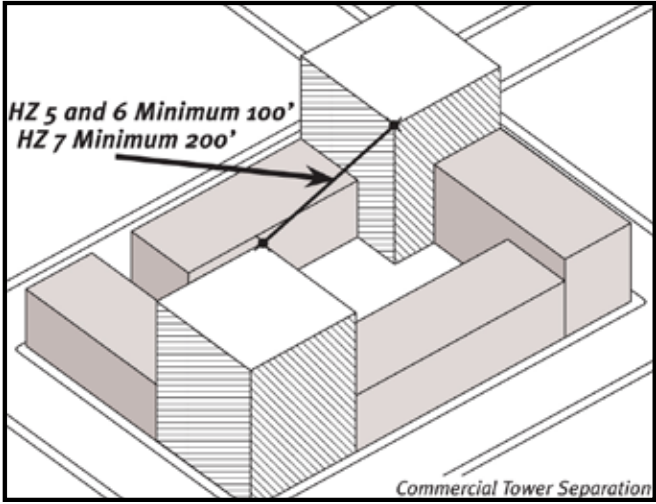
D4D Tower Separation Requirement (H2-5)
